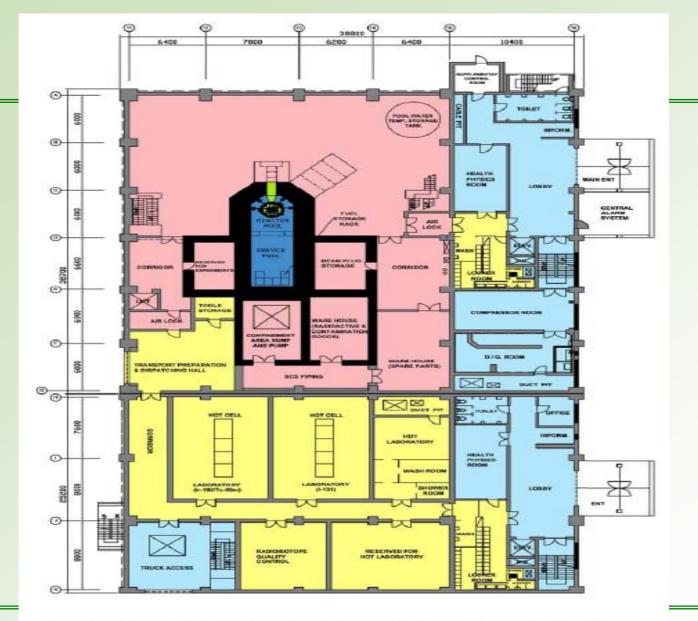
Floor 0 layout of the reactor building and the RIPF building
